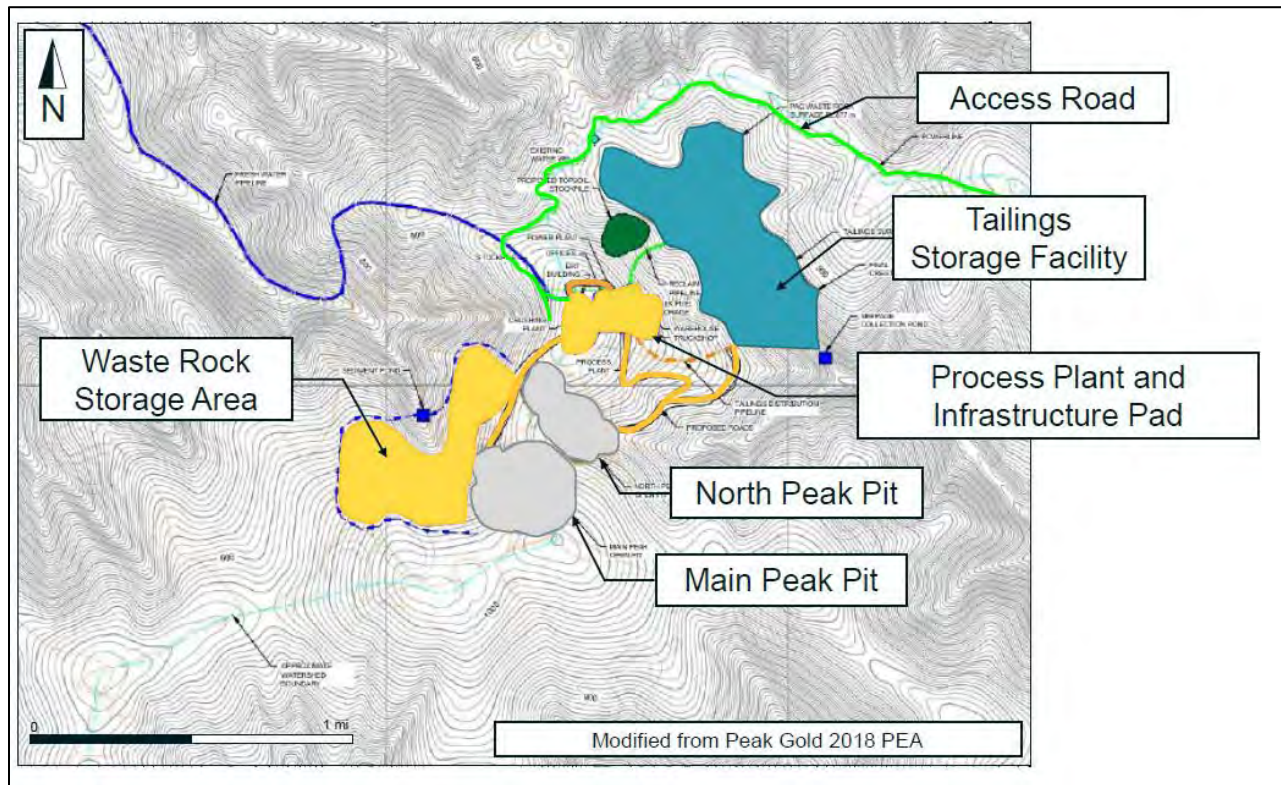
Manh Choh Process Facility and Tailings Storage Facility Alternative 1 (Stantec 2021a, Kinross Alaska 2020)
